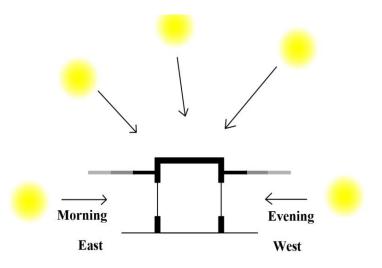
Horizontal Overhangs (They Do Not Work on East and West Facades)
